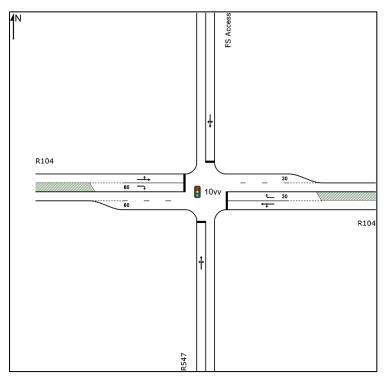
Intersection 10 Proposed Layout (Background Traffic)
